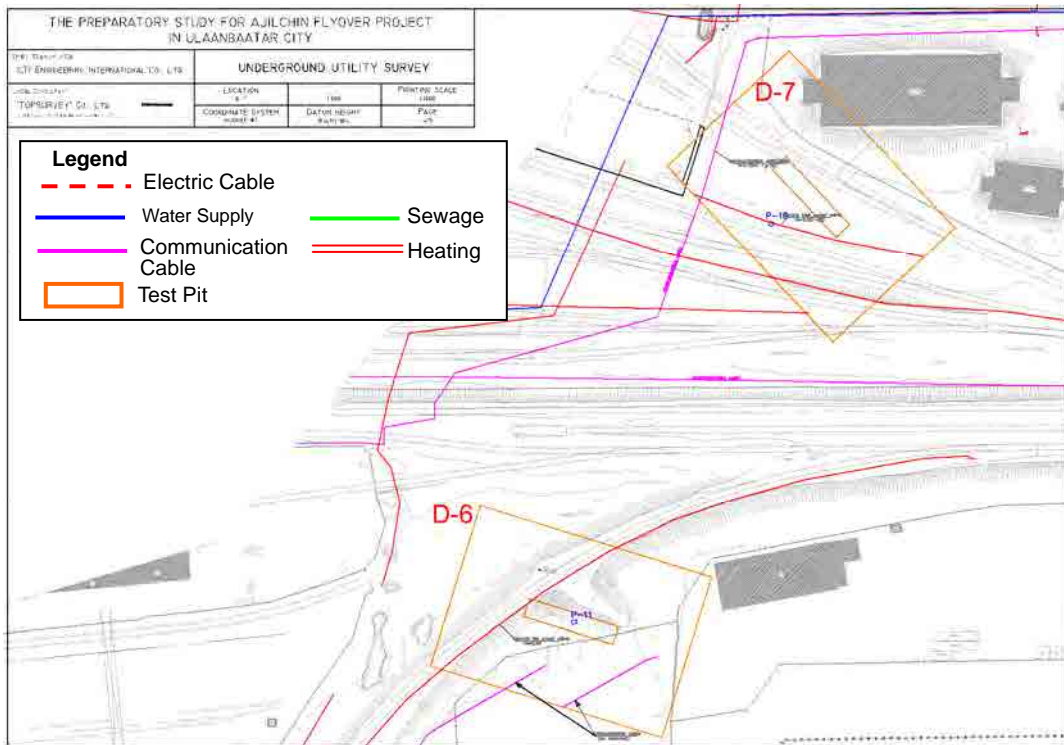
(4) Detailed Figure of Test Trench Location (D-6 to D-7)
